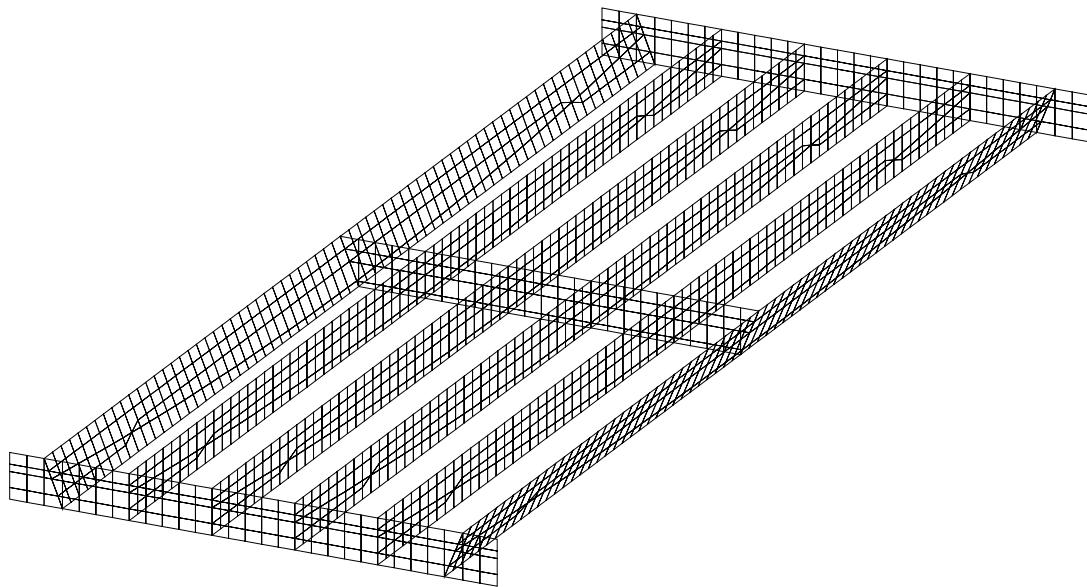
Bridge G1697S Shown Without Bottom Sofit and Top Deck
